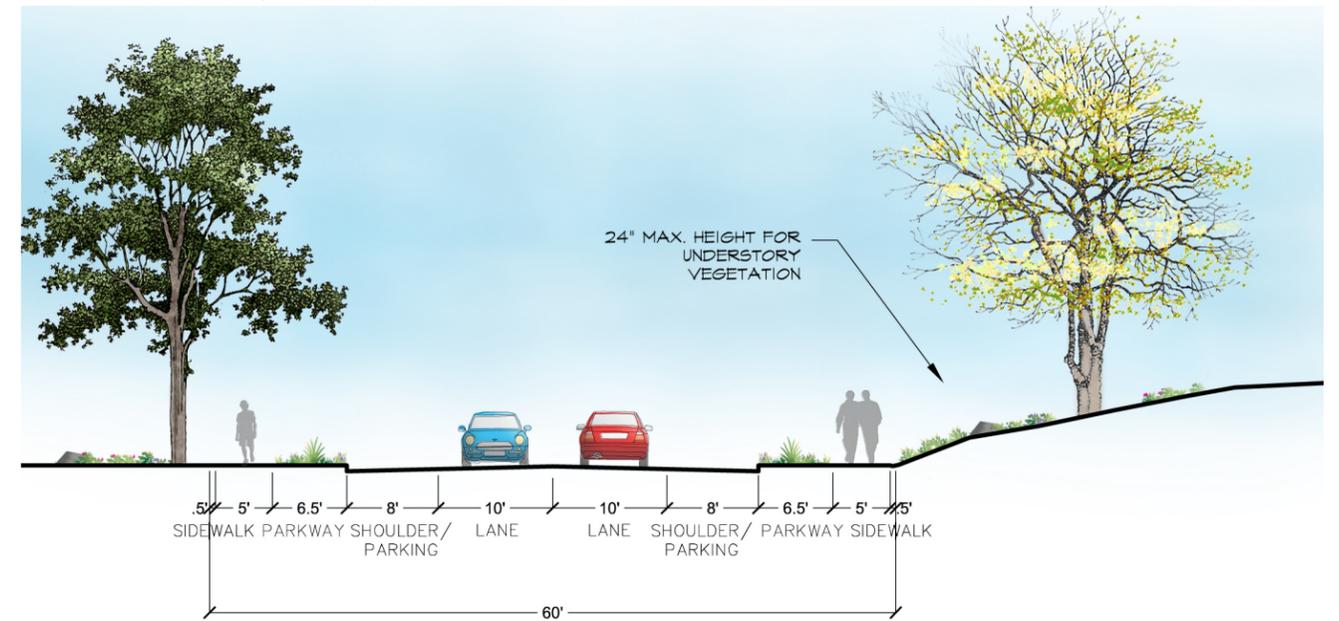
STREETScape DESIGN (SECTIONS K, L, M, AND M ALTERNATIVE)
